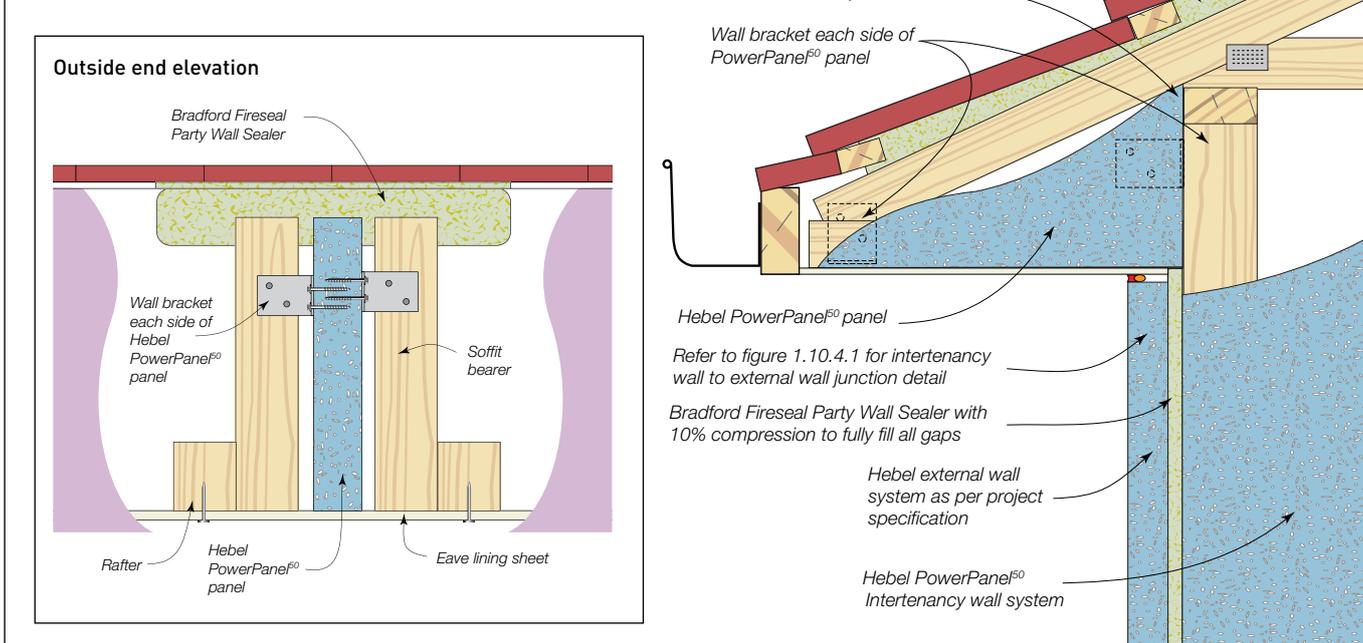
Roof parapet for PowerPanel<sup>50</sup> Intertency Walls
